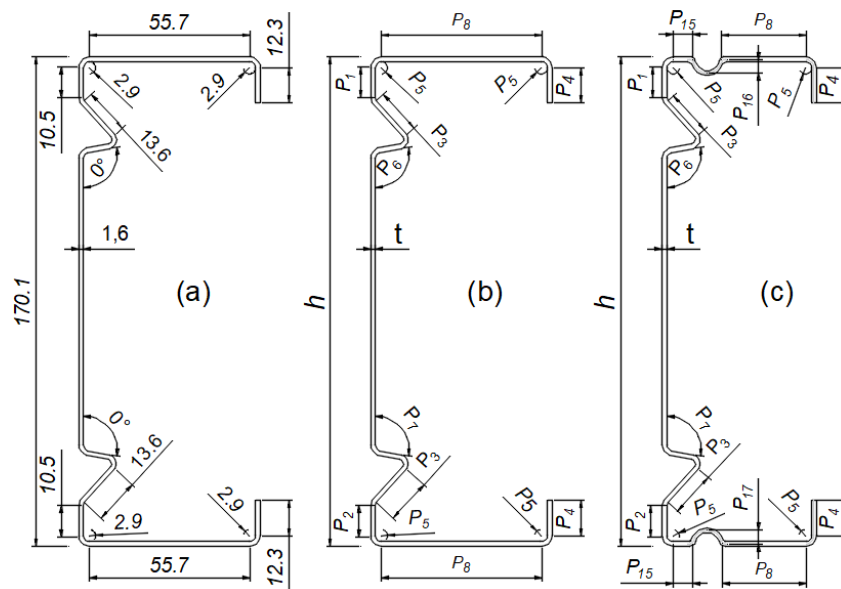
Dimension parameters in (mm) and definition of design variables of the channel cross section (a) reference section, (b) without flange stiffeners, and (c) with flange stiffeners
